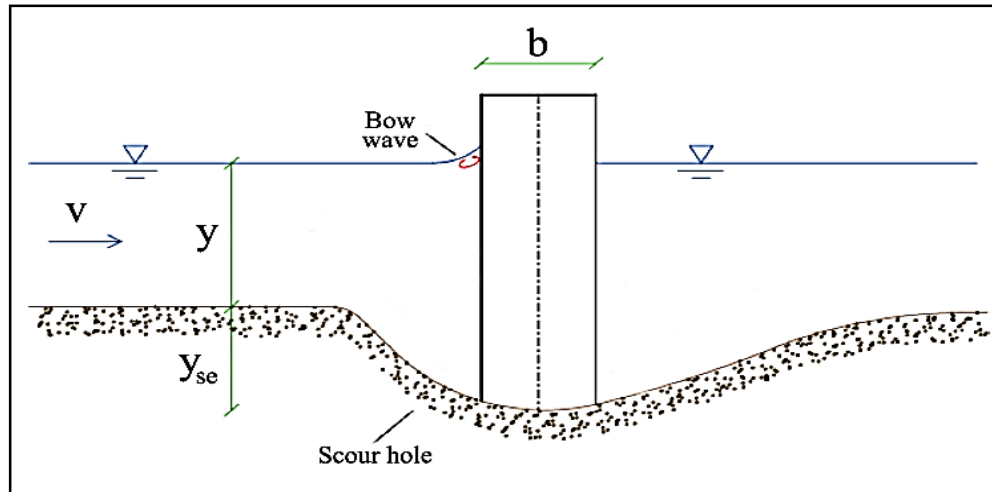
Schematic drawing of bow wave at bridge pier (Melville and Coleman, 2000).
